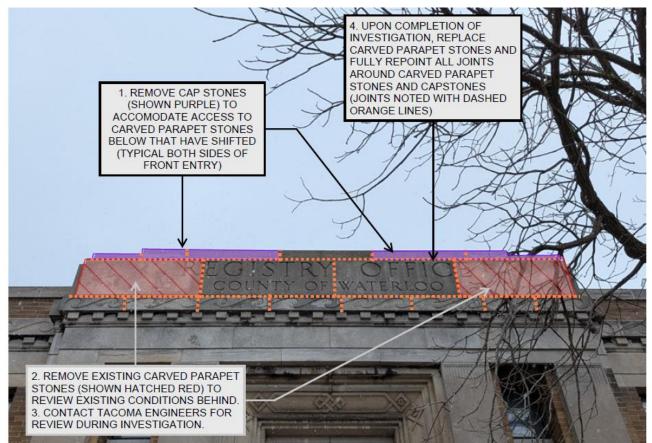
Limestone Parapet Investigation – 122 Frederick Street (Tacoma, 2025)
